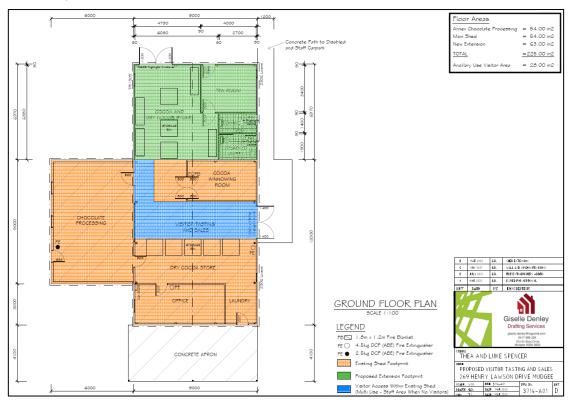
Floor Plan (Source: Giselle Denley Drafting Services)
